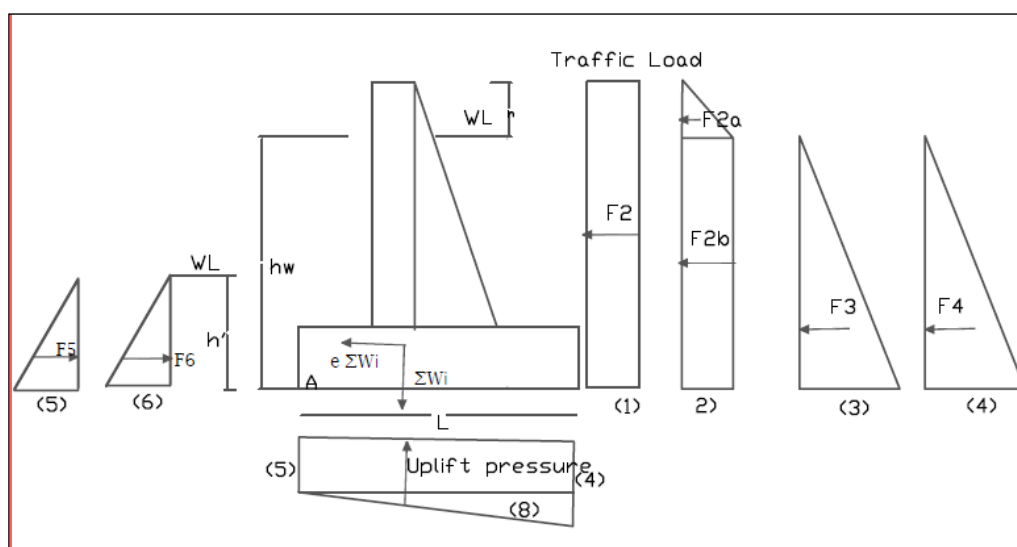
Typical Loads or Forces acting on Flood Walls
